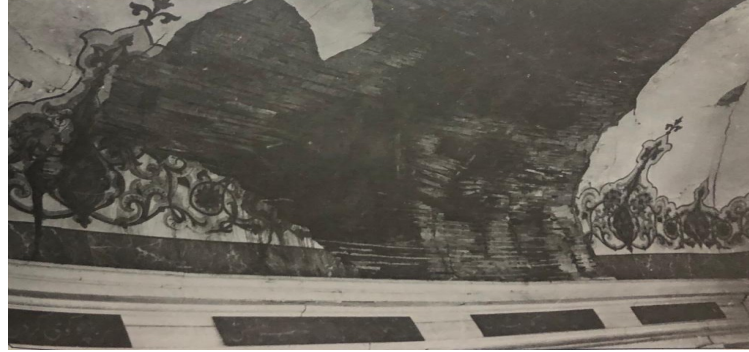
The damaged ceiling of The Bahariye Semâhane in the late 1920's (Encumeni Archives)
